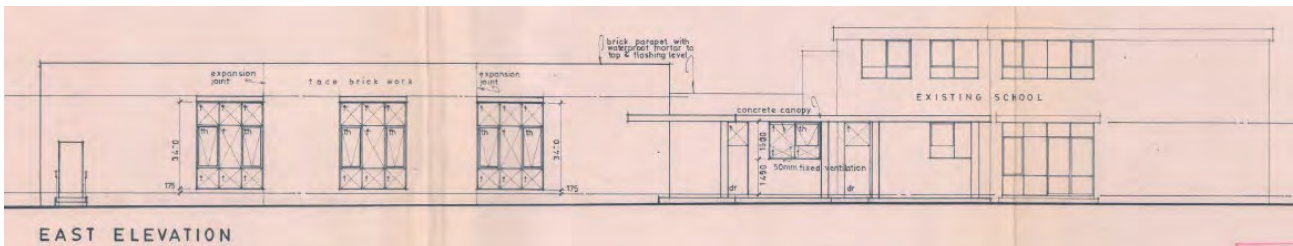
Drawing related to building permit 7845. Proposed east elevation (Nicholas Katris & Assoc. June 1979) (Source: Council Building File)
